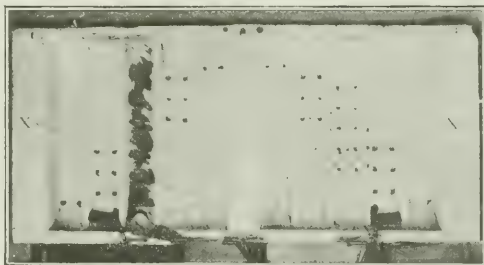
BEAM SHOWN IN FIG. 1 WITH CRACKS FROM LOAD ON BOTH UPPER AND LOWER FLANGES
